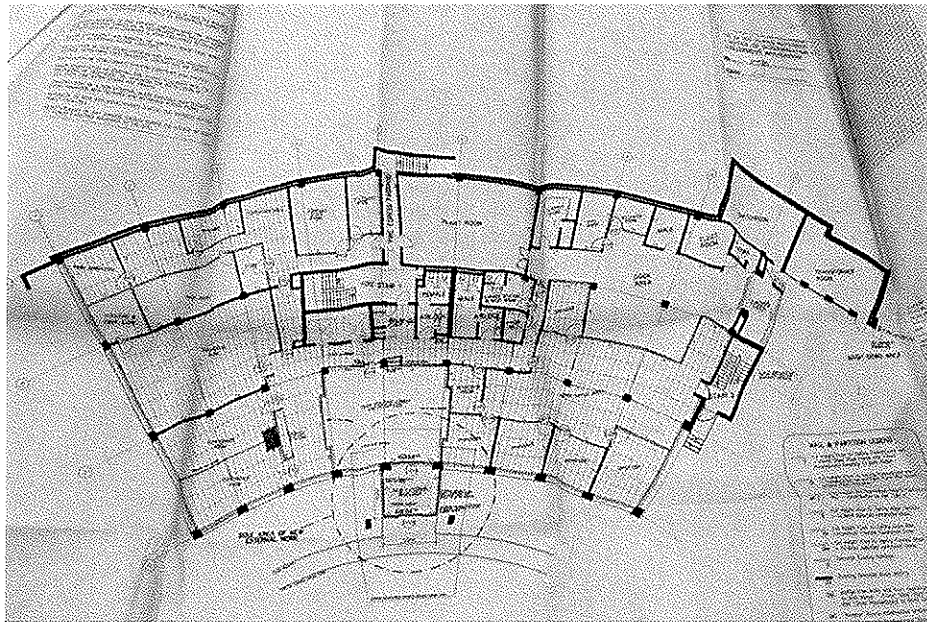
Ground floor plan of the Proposed Total Refurbishment by architects Davenport Campbell dated 1989
